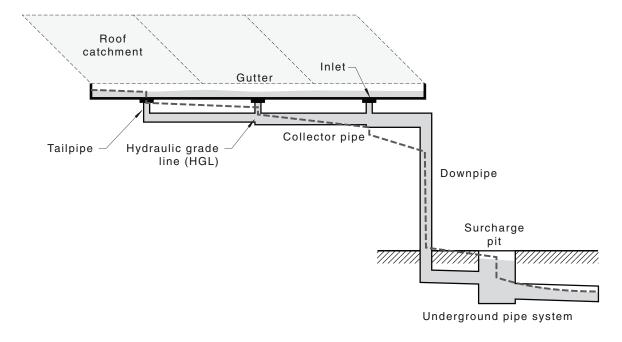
SIPHONIC PIPED ROOF DRAINAGE SYSTEM—FLOWING FULL AT DESIGN FLOW RATES
